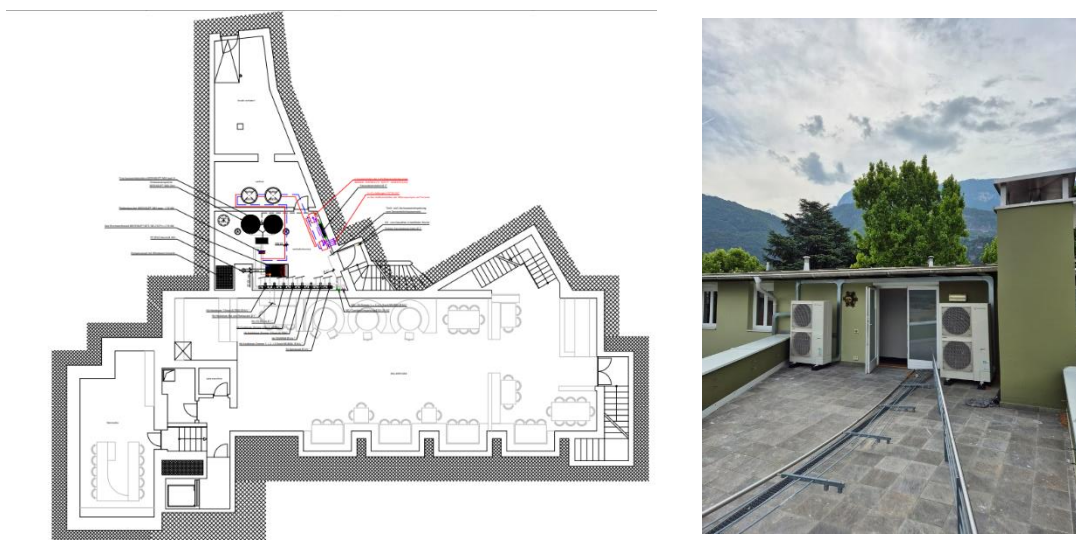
& 4. The hotel outdoor units installation, plans and picture
